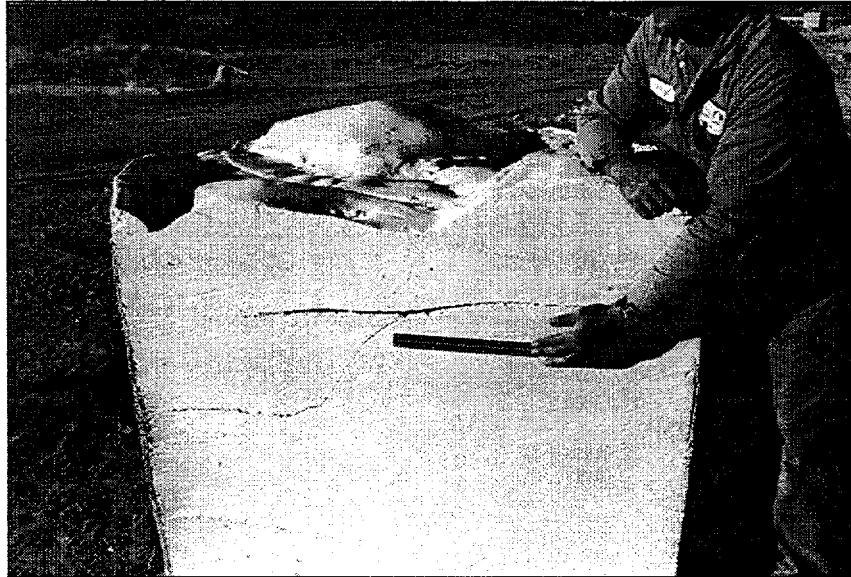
Block #02-03 Showing Cold Joints between Pour Layers
